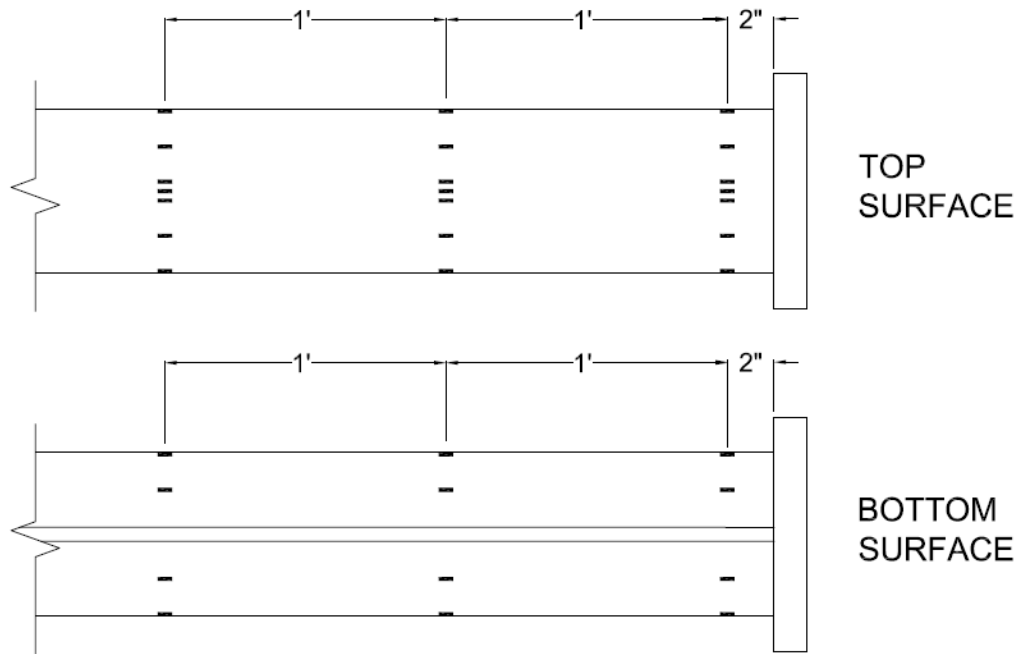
W24x62 non RBS Specimen - Typical Strain Gauge Layout (Top and Bottom of Top Flange)
